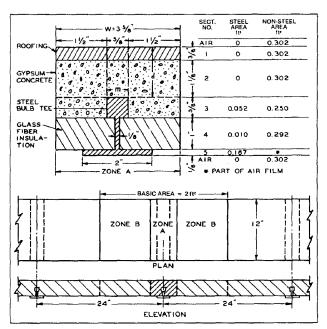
Gypsum Roof Deck on Bulb Tees (Example 4)
